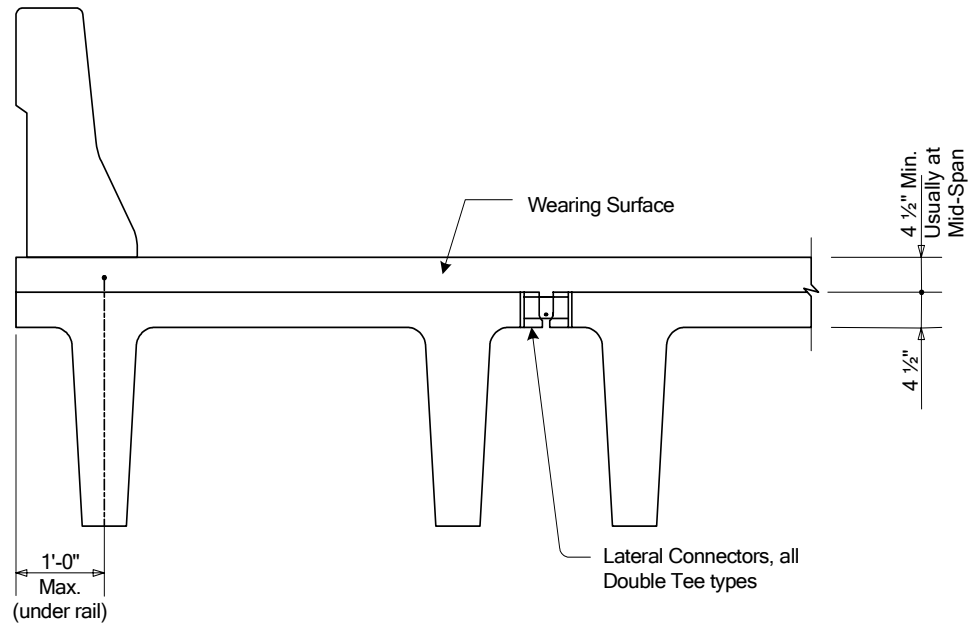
Prestressed Double Tee Beam Typical Section
